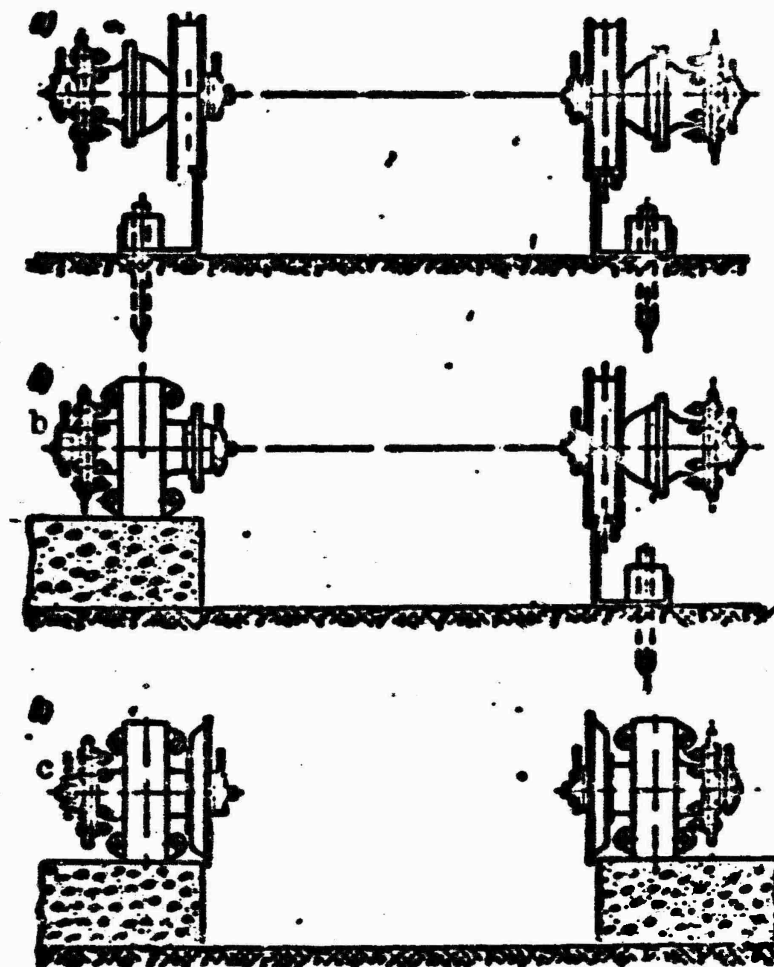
Paving forms and the movement of wheels of machines for constructing cement concrete pavements. a) Motion over paving forms; b) motion over finished slab; c) motion over finished slabs.
